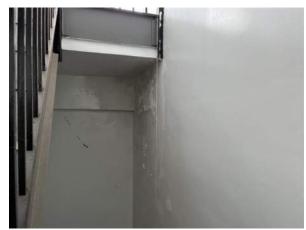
Peeling/bubbling paint at Leak Location Figure 5: Deteriorated plaster ceiling at Leak #2.
